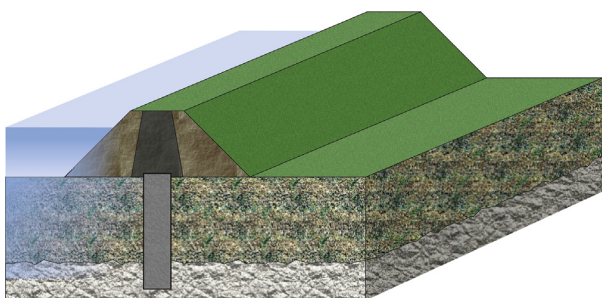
Schematic overview of a cut-off wall below an earthen dam.
